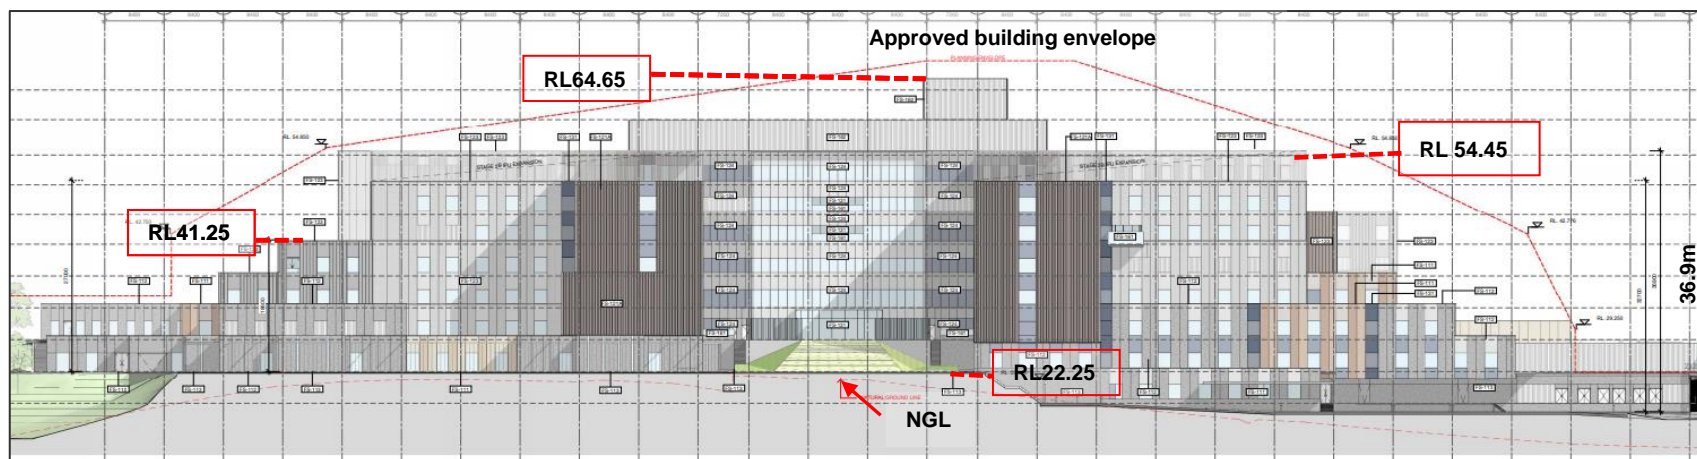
| Proposed western elevation of the Multideck carpark with approved Concept Plan envelope shown in red (Source: Applicant's RTS)
